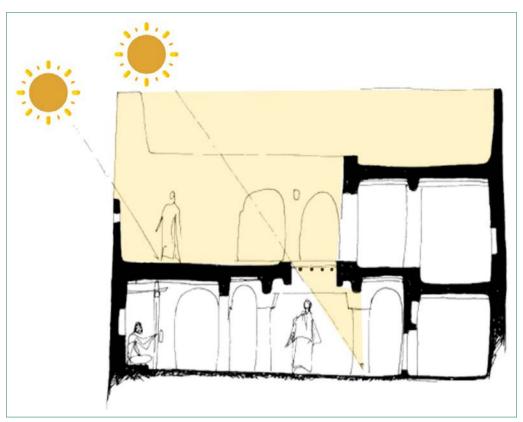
Section through a traditional house in the Mzab Valley showing the used of the terrase and the lighting of the dwelling (Rezaei, 2021).
